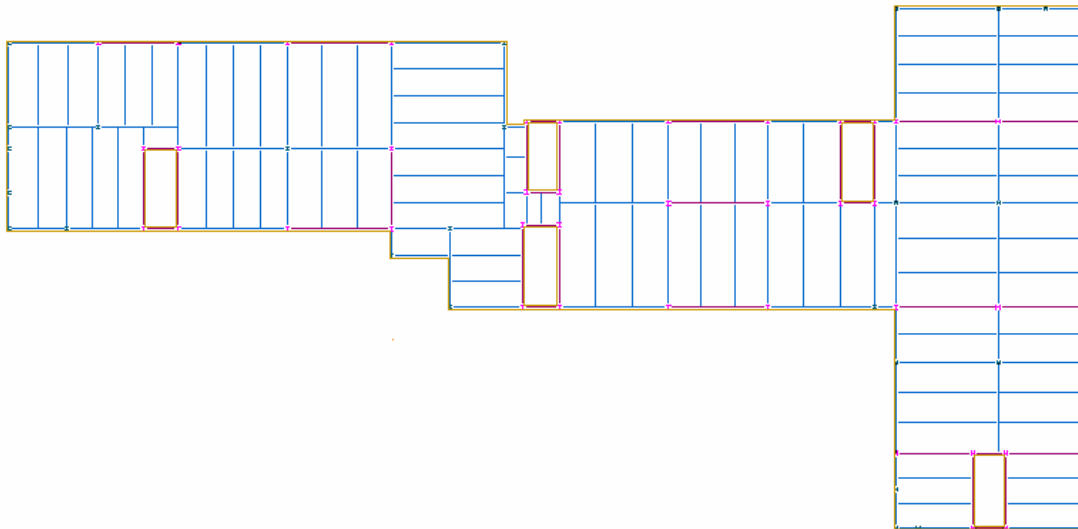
Typical plan showing structural layout, Levels 1 and 2
